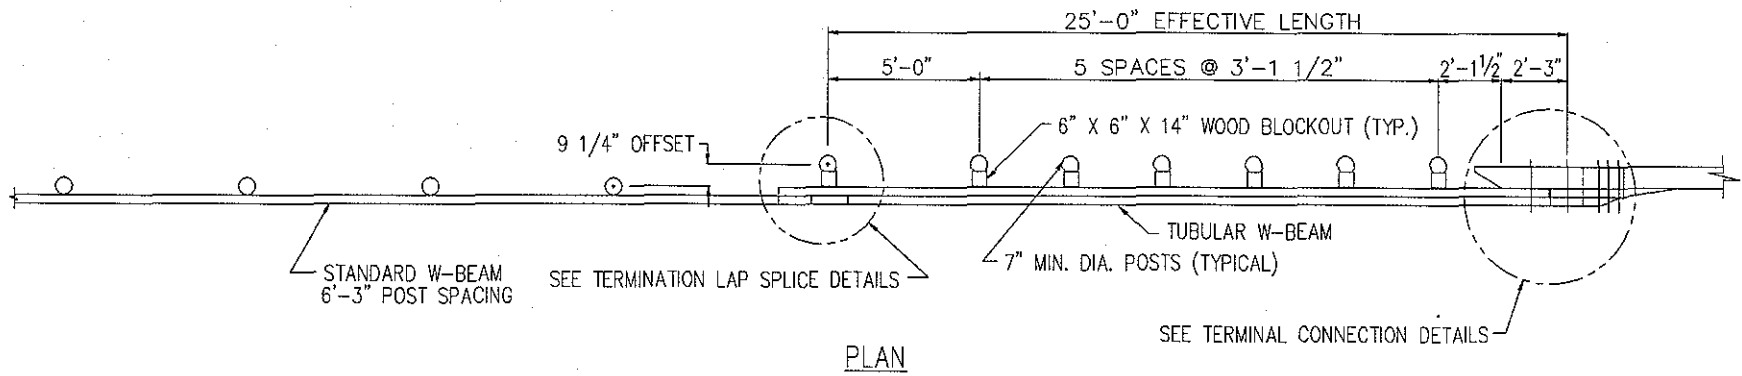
TUBULAR W-BEAM TRANSITION FOR NEW CONSTRUCTION INSTALLATIONS
